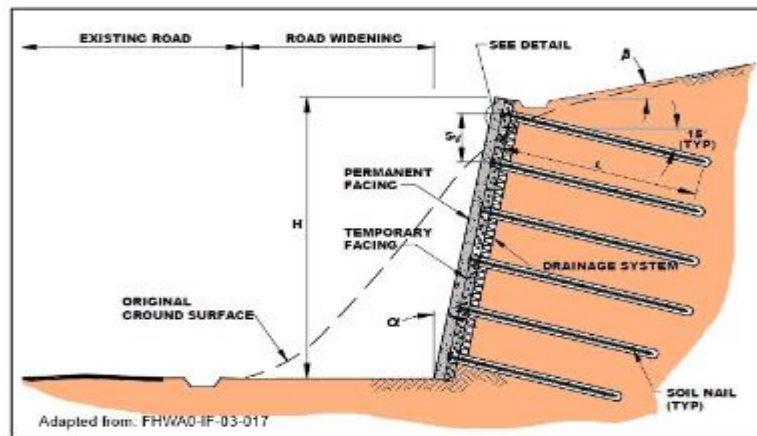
Soil nailing wall on a hill side steep cut slope of road section (FHWA)
